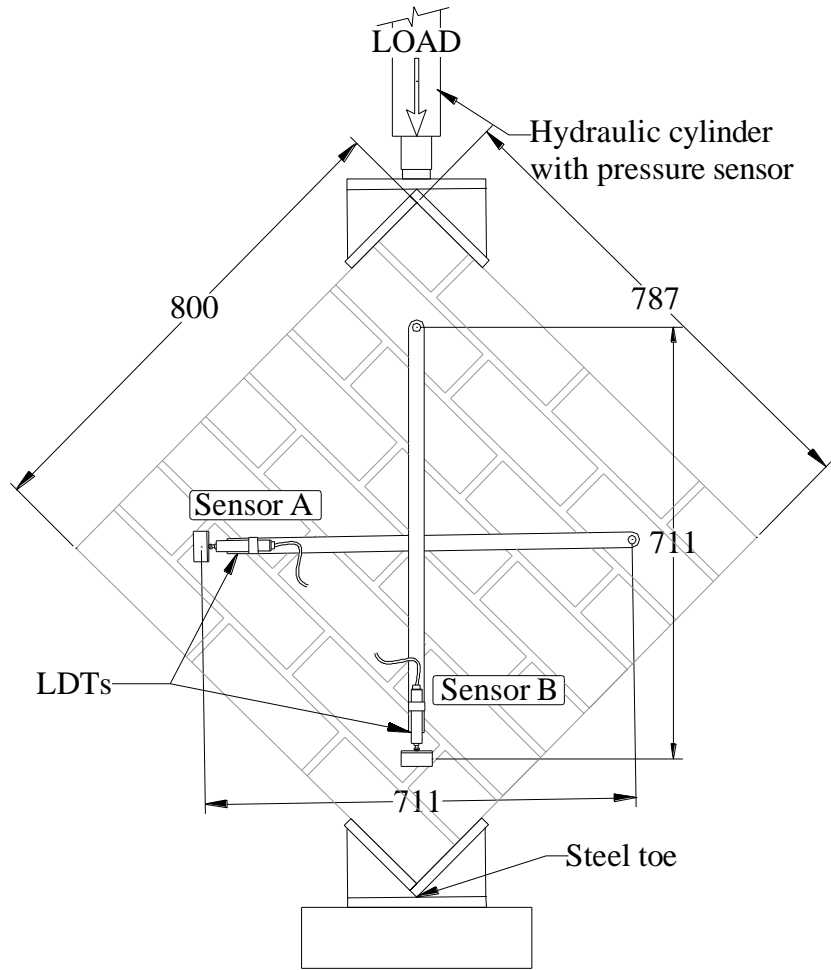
Diagonal compression test setup for shear characterization of earthen masonry wallettes. Dimensions in mm.
